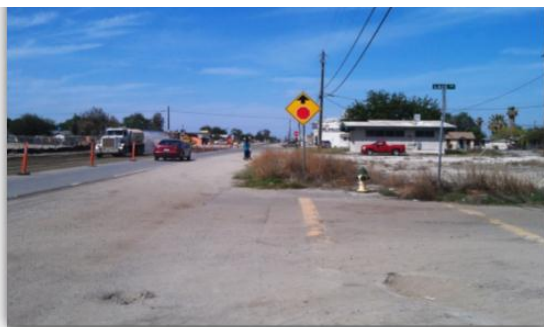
Sidewalk improvement proposed at Avenue 54 at Lake Road, Existing sidewalk is less than 3 feet wide and not in compliance with ADA standards.
